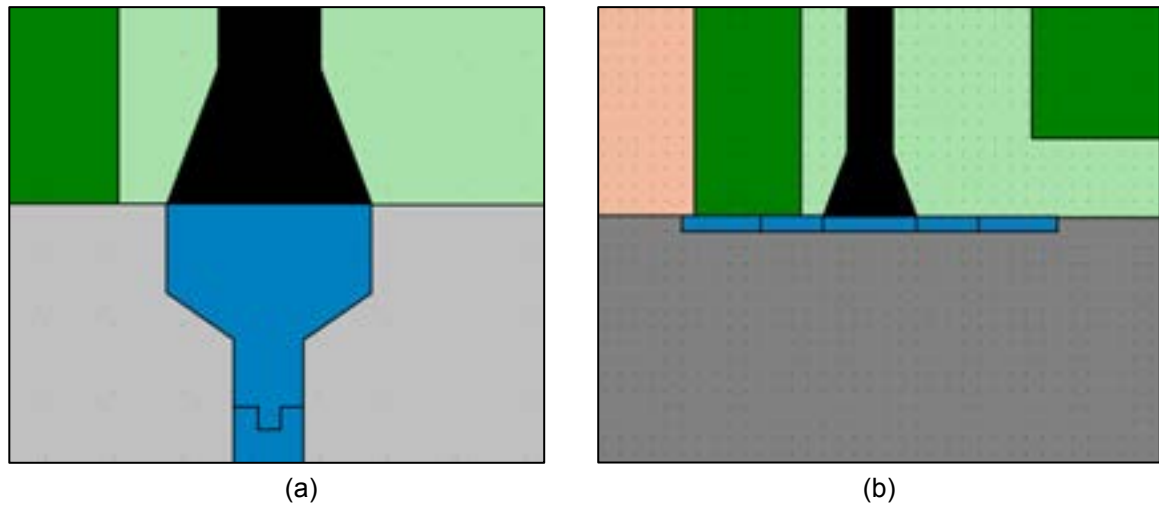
(a) Typical plinth profile at Section 1 and (b) 12 m concrete plinth at Section 2
